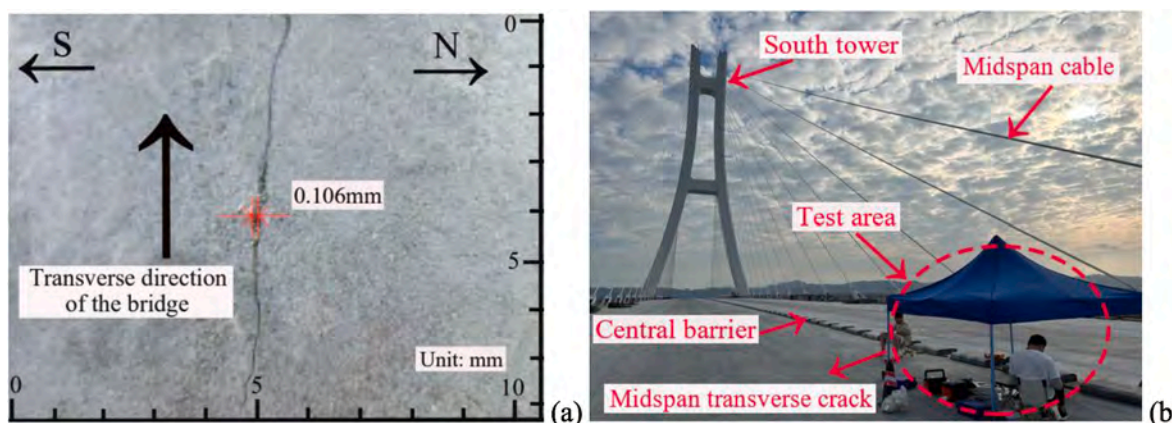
Field monitoring: Cracking pattern on UHPC deck layer (a). On-site photo (b).
